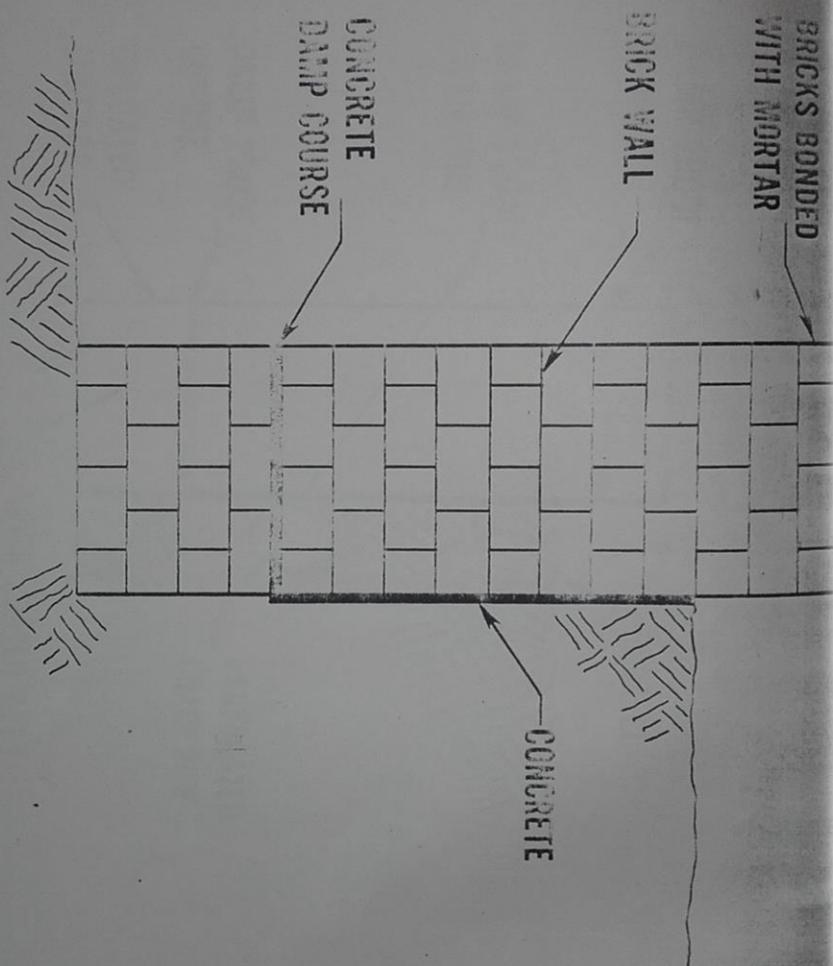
Measures currently used to protect walls. Concrete slabs are coated with a breather material.
